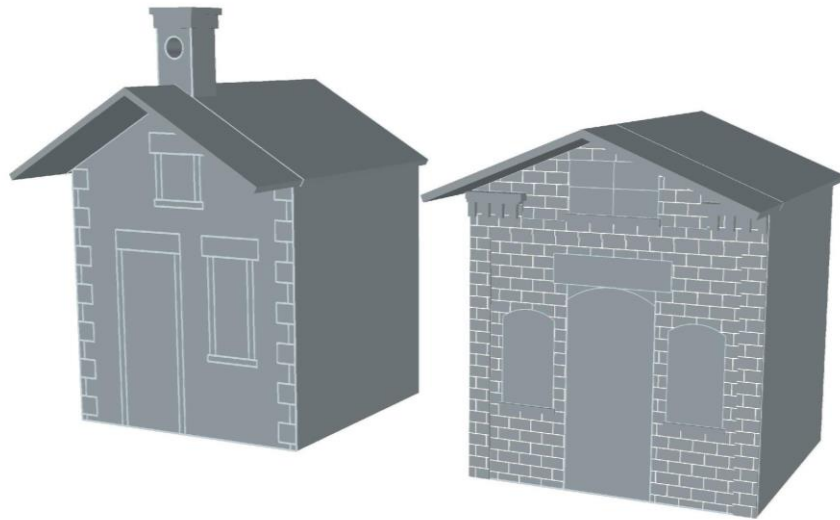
(left to right) 3D CAD Façade Drawings of Keegan Mill and Kenney Store
